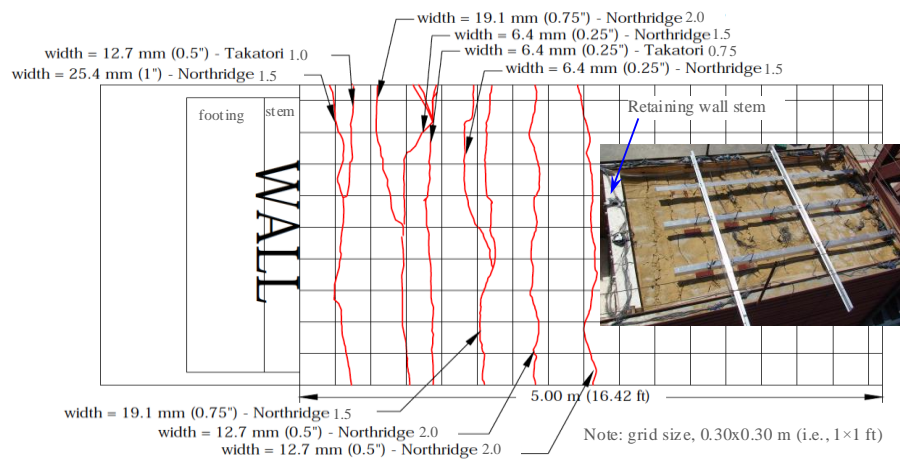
Crack pattern in backfill for retaining wall without sound wall
